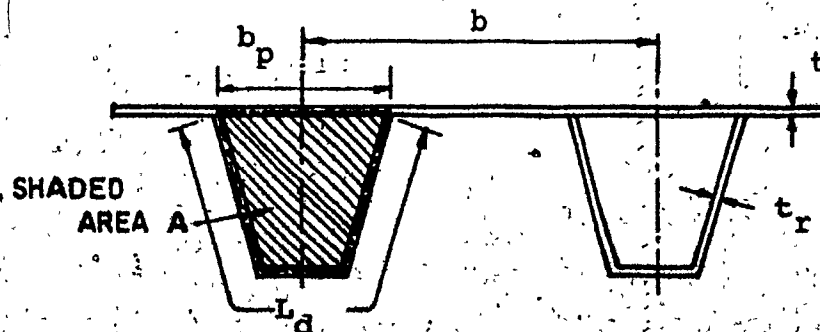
DIMENSIONS OF CLOSED RIB
